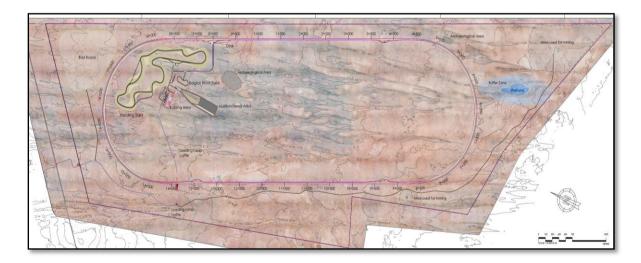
Alternative High Speed Proving Ground Layout no. 1
